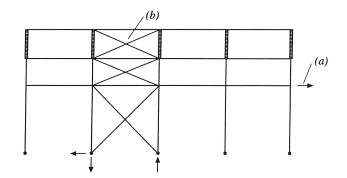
Transfer of external loads through bracing into the foundation. (a) braking force from crane, (b) bracing to provide torsional resistance at beam ends.
